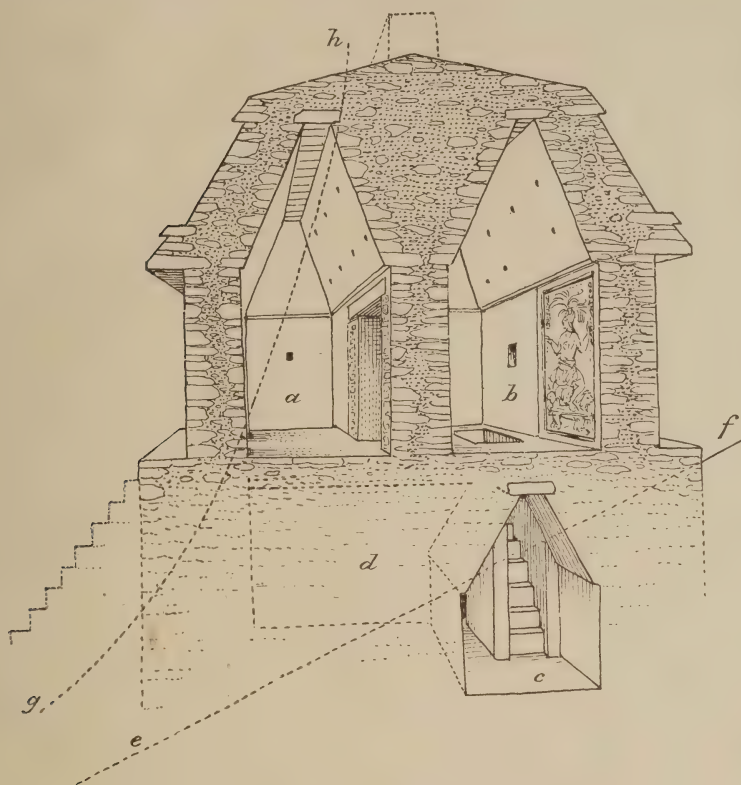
SECTION AND PERSPECTIVE OF THE TEMPLE OF THE BEAU RELIEF.
